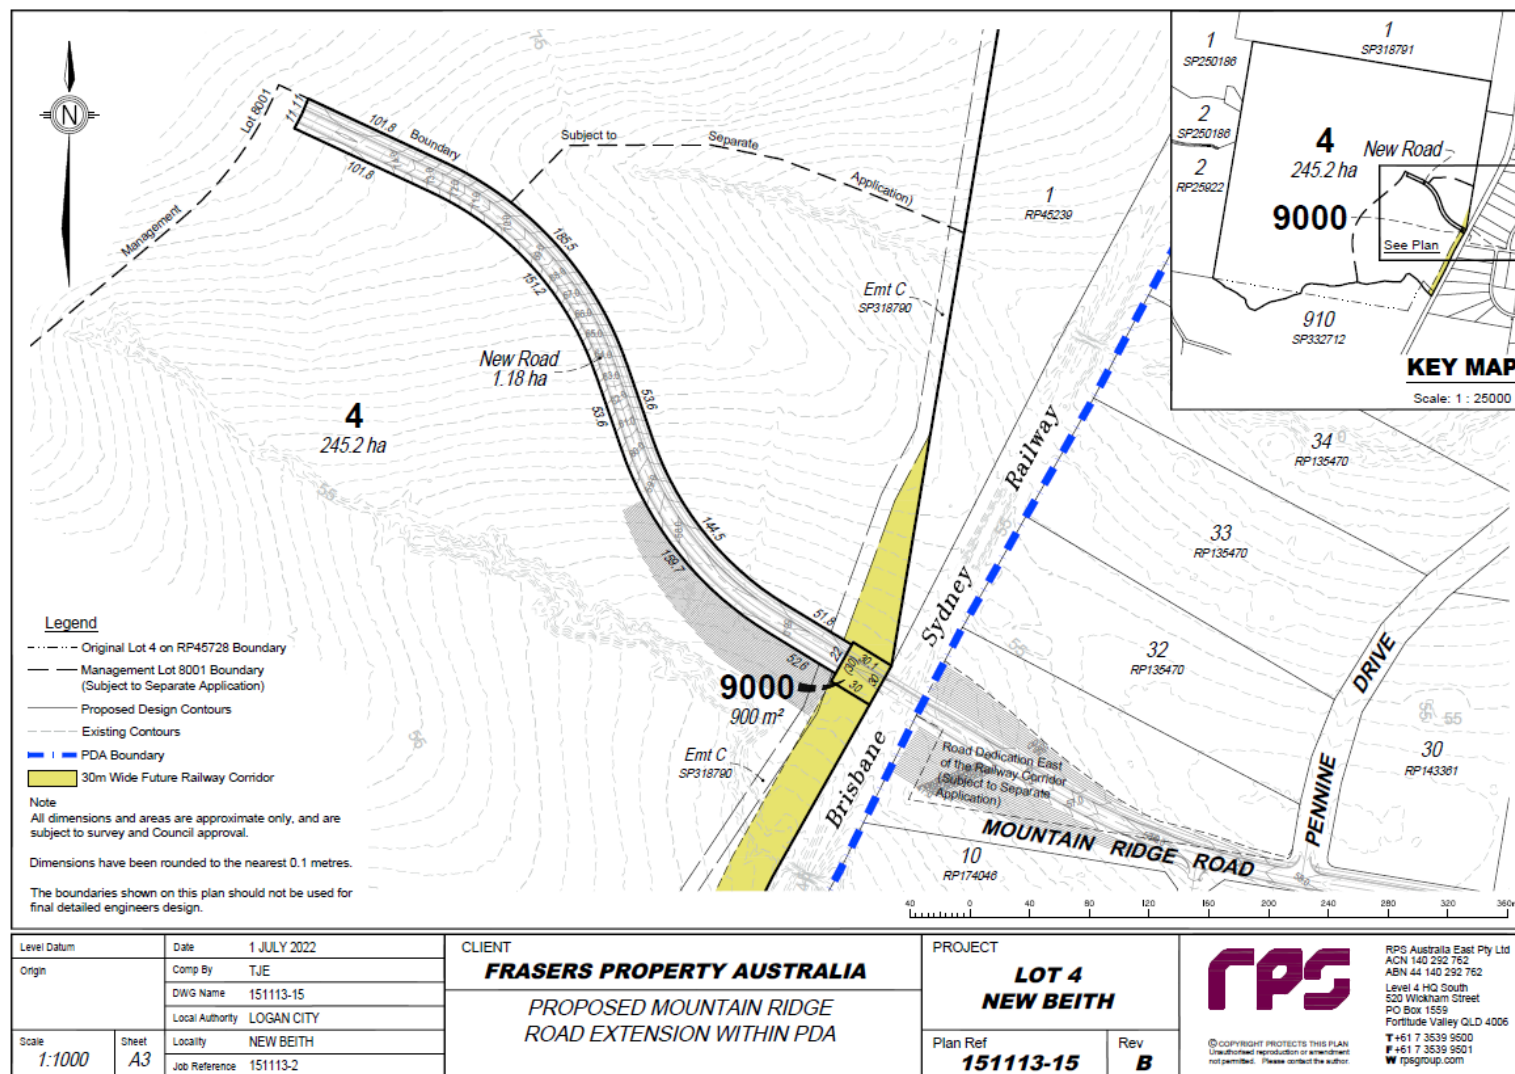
Proposed Mountain Ridge Road Extension within New Beith and Greater Flagstone PDA
